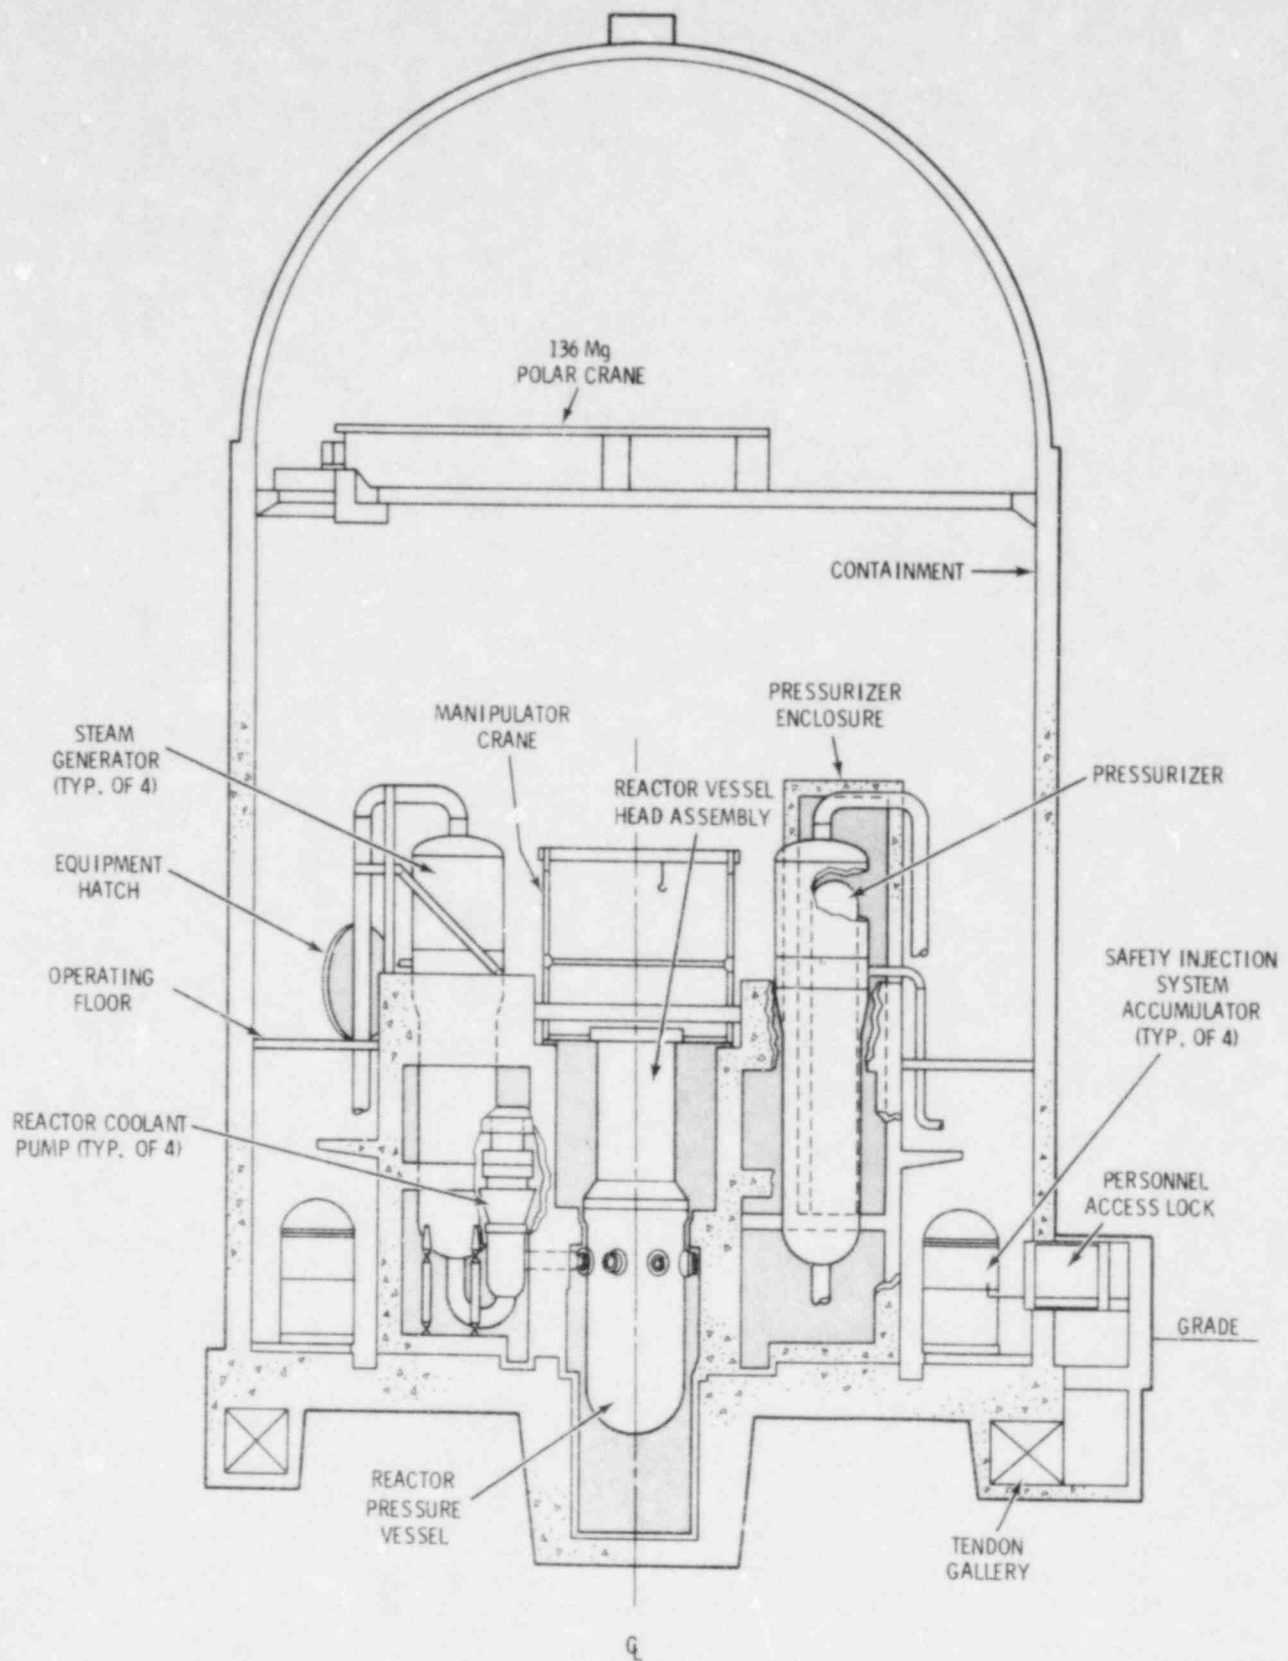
Vertical Section of PWR Containment Building
